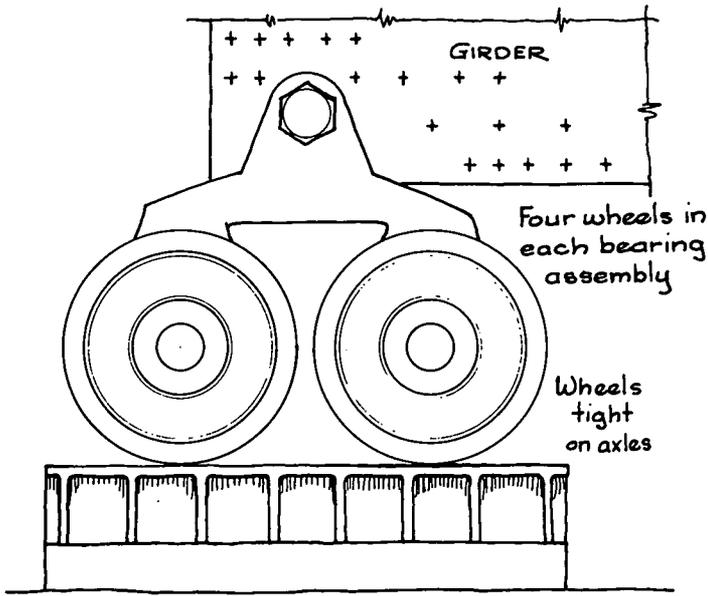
Bearing for a two-span truss bridge (1929). The axles froze in their bearings, locking the wheels which then just slid back and forth on the cast-iron bearing block.
